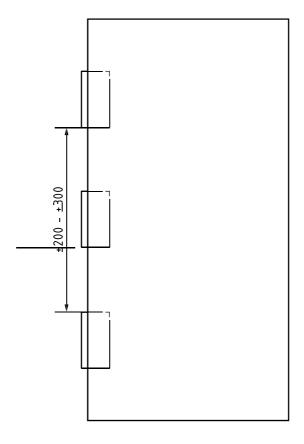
Position of single latch/lock and strike plate - Alternative
